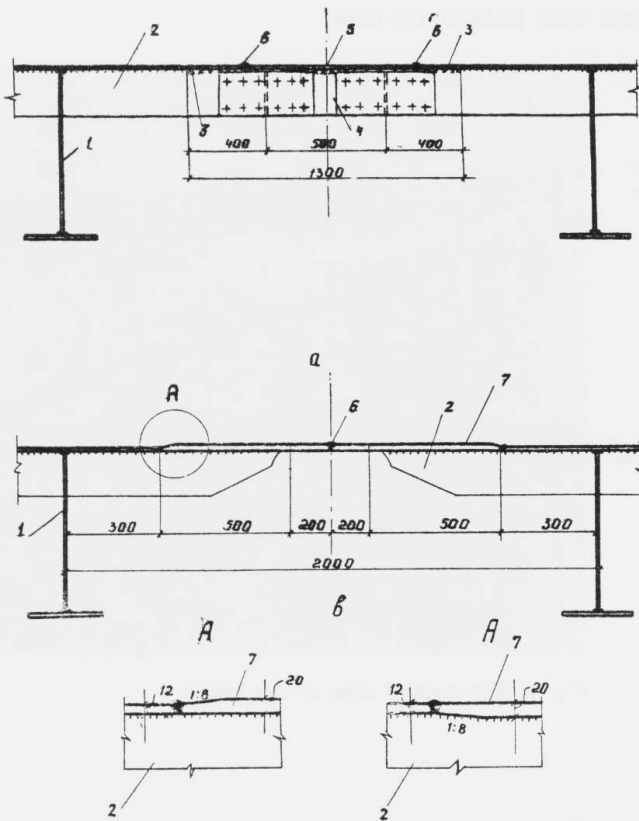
Field joints of the orthotrope deck: a) generally accepted solution; b) construction of the Inst. "Ukrprojektstalconstructsia"; 1 - transverse girder; 2 - longitudinal rib; 3 - field weldings; 4 - field inserts of the ribs; 5 - field inserts of the floor; 6 - field joints of the floor; 7 - thickening of the flooring.
